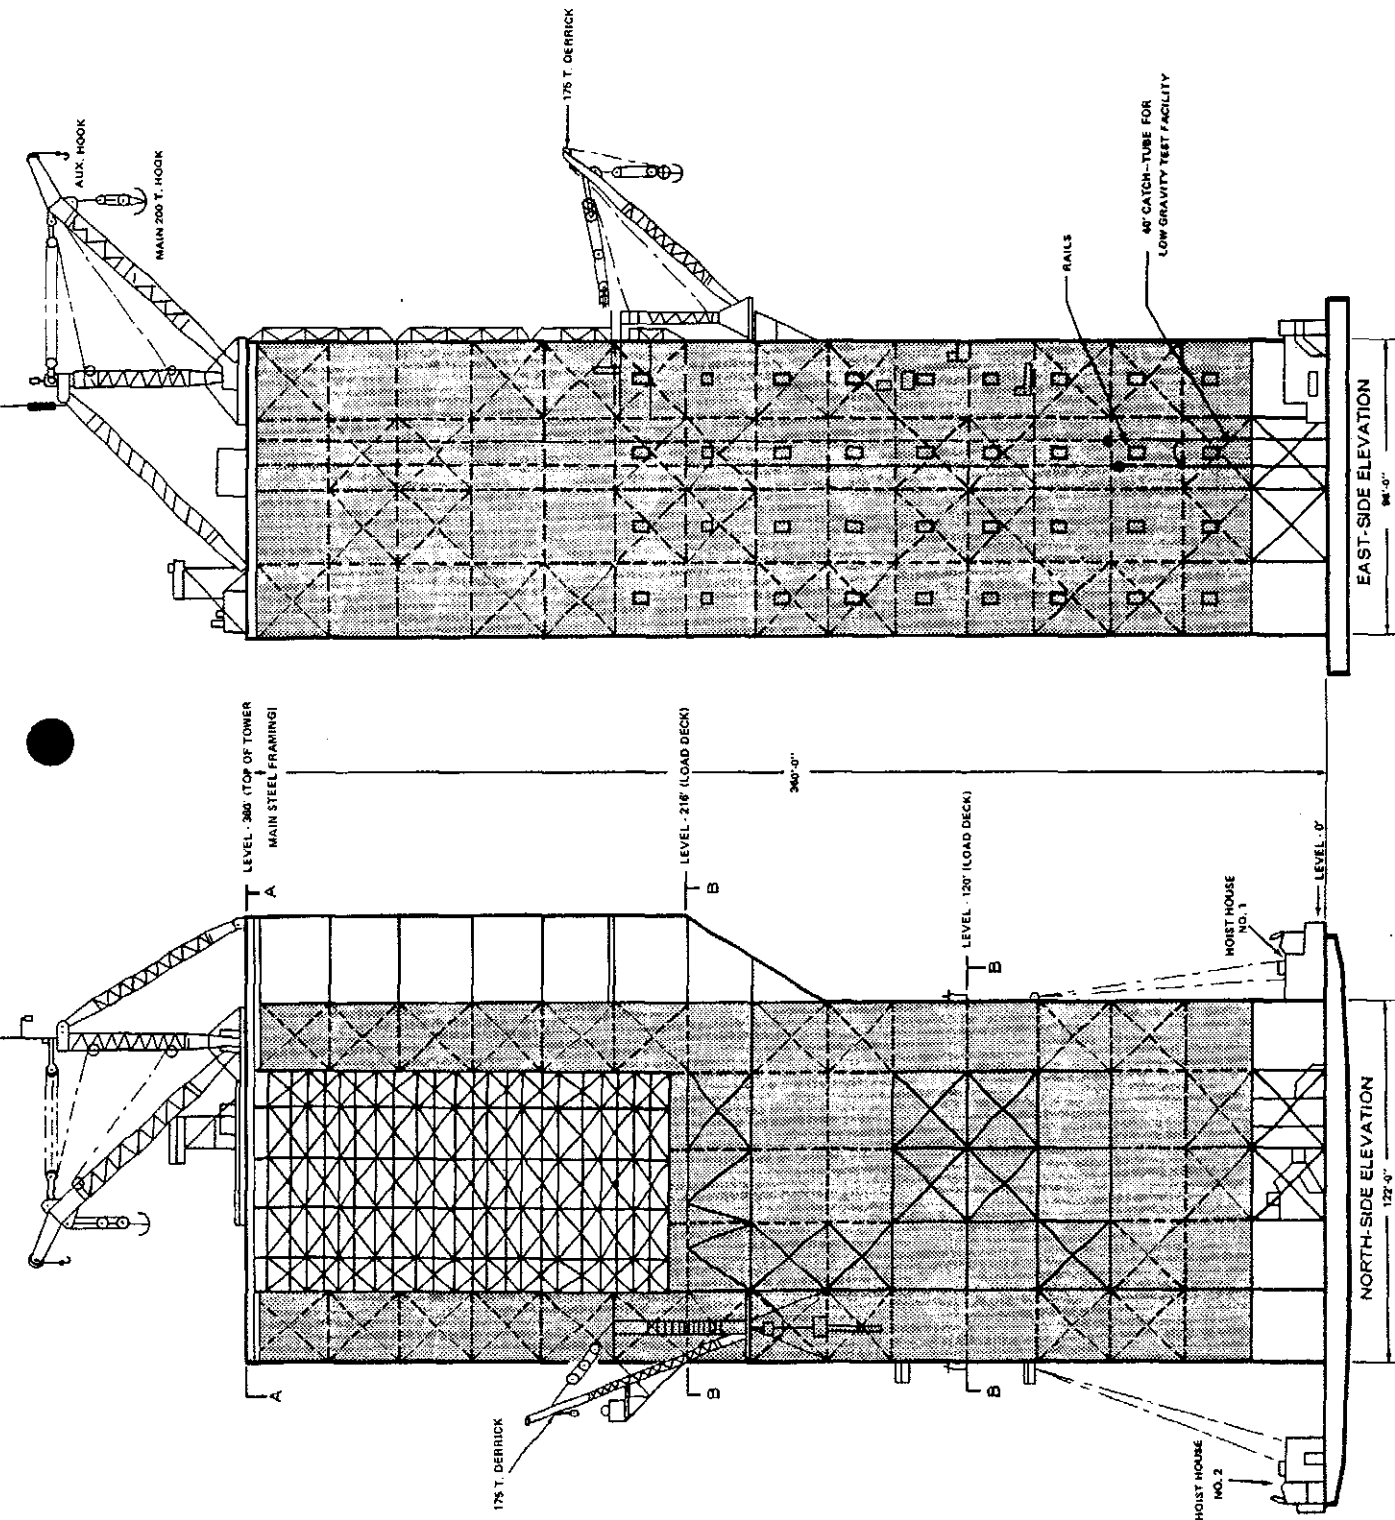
Elevation drawings of the Structural Dynamics Test Facility (Building 4550) at NASA's Marshall Space Flight Center. (Source: Master Planning Office, Marshall Space Flight Center)
